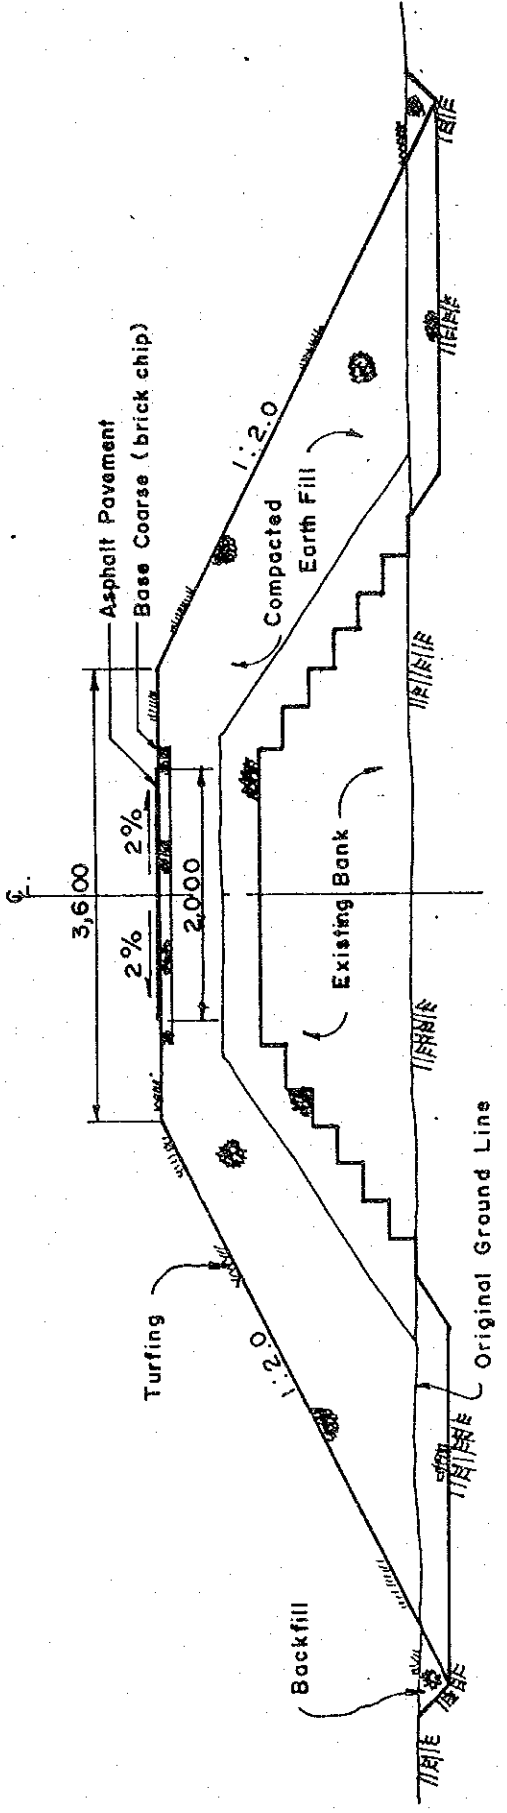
TYPICAL CROSS SECTIONS OF FLOOD EMBANKMENT
